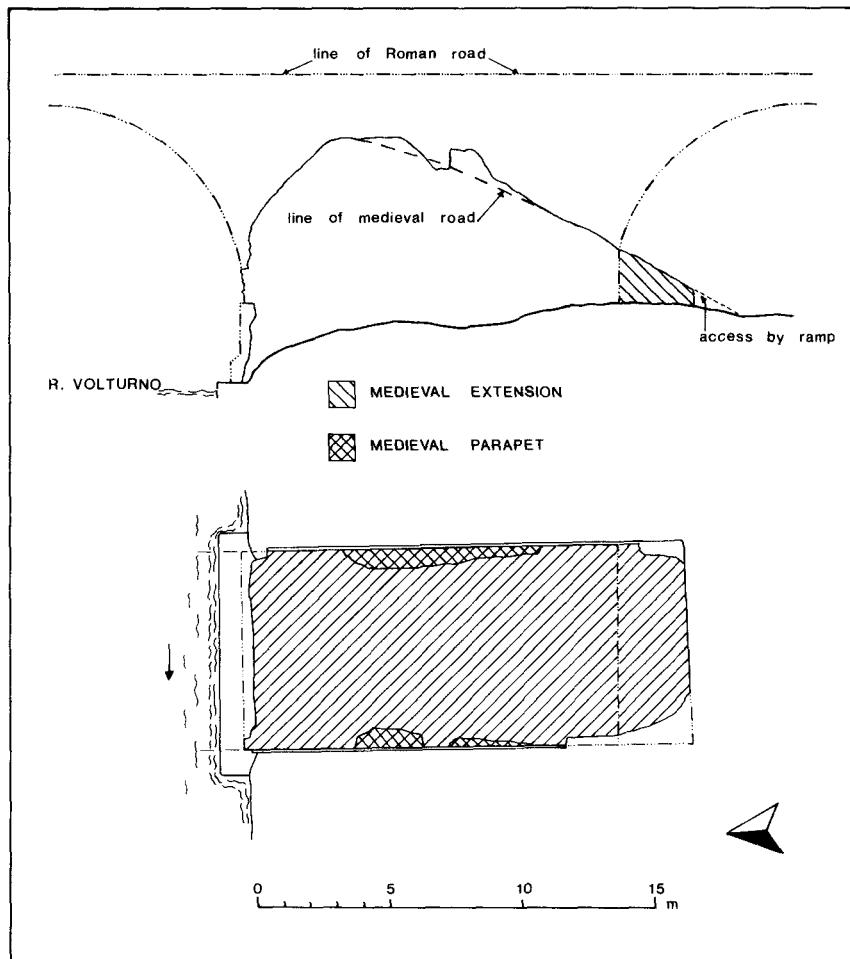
Sketch of the south pier of the Ponte Latrone illustrating the plan and profile of the early medieval bridge. (Drawn by Andrew Hanasz)
